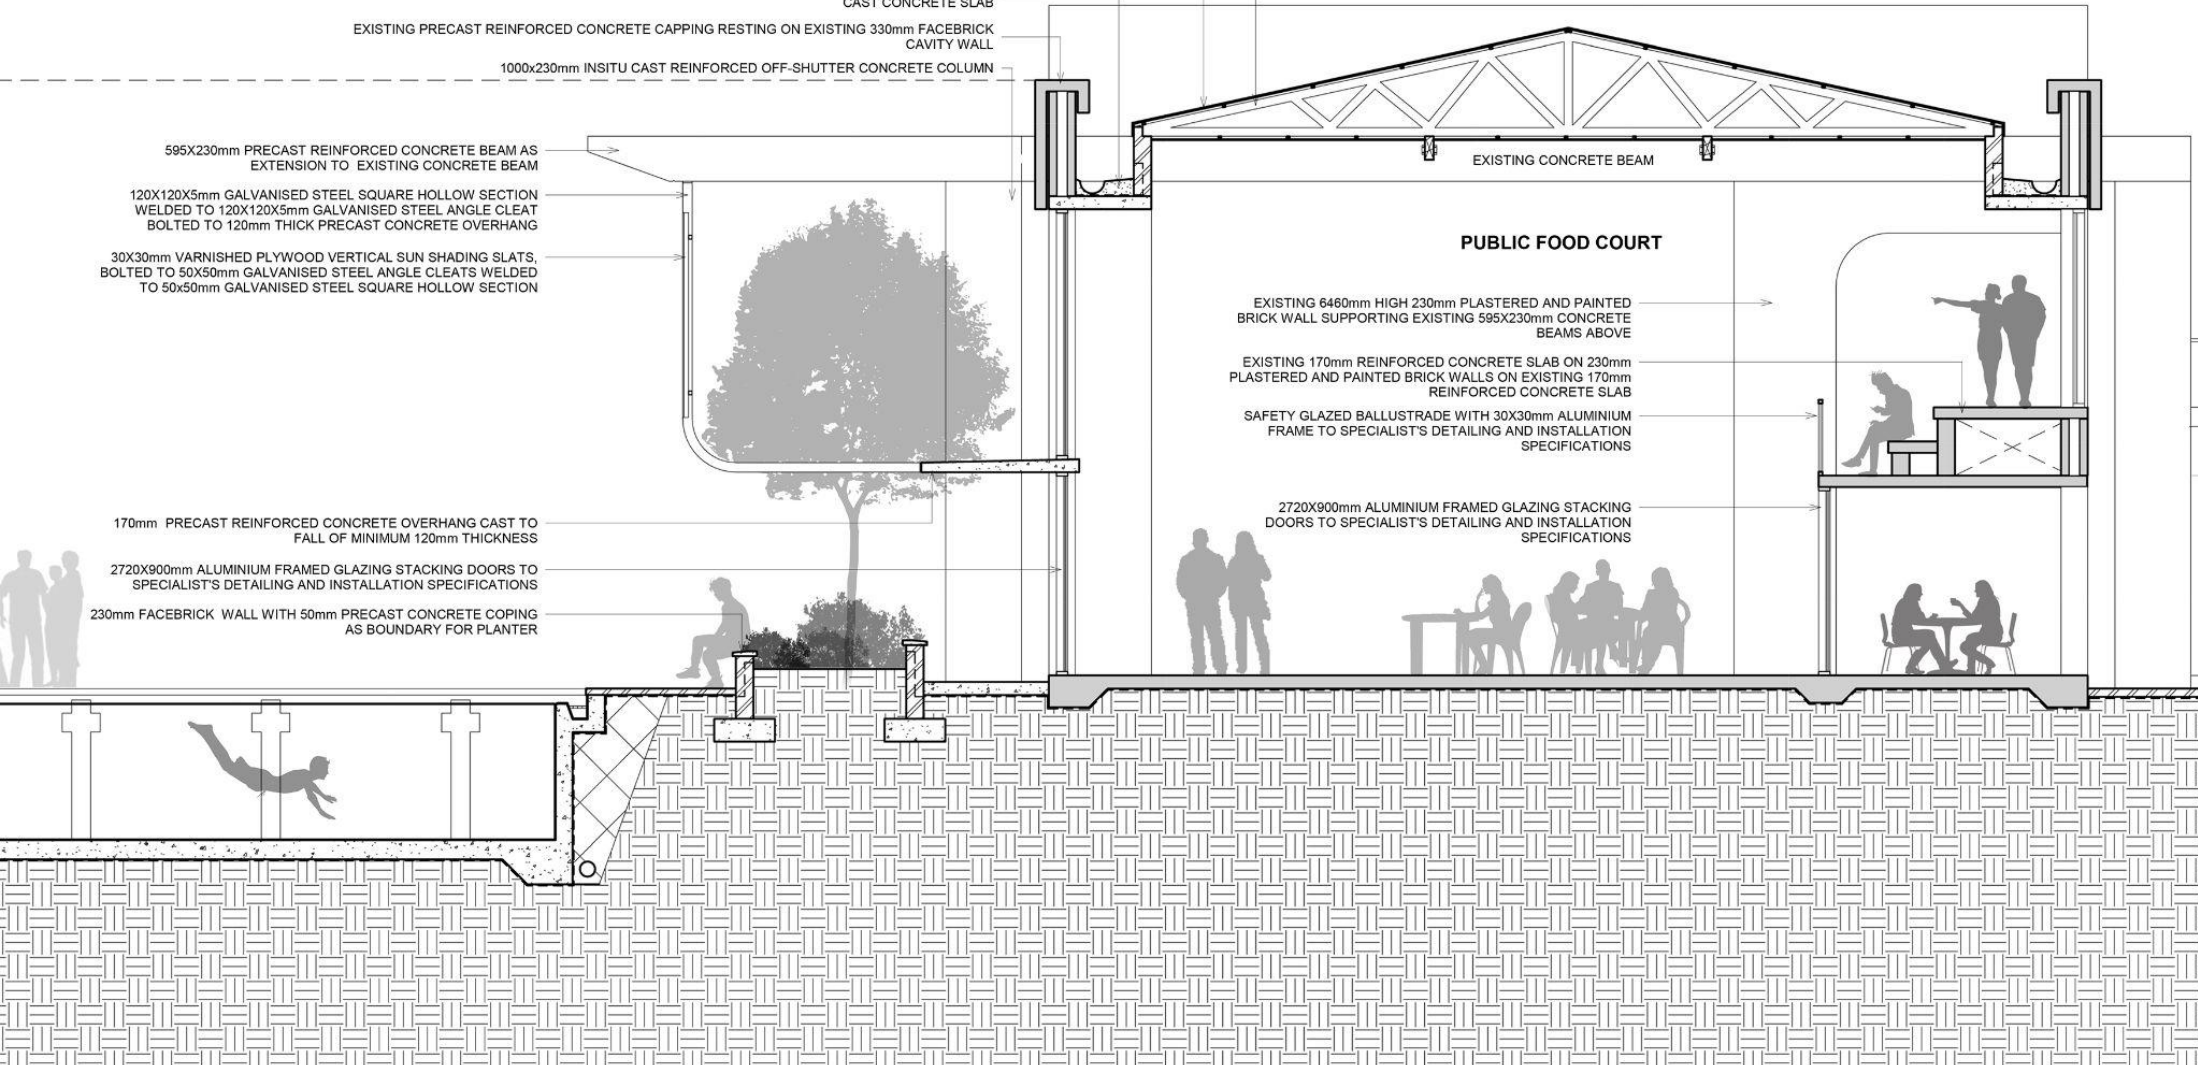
Callout of area on section where language 3 was expressed: Section through the food hall showing the stepped facade and shading (Author, 2021)
